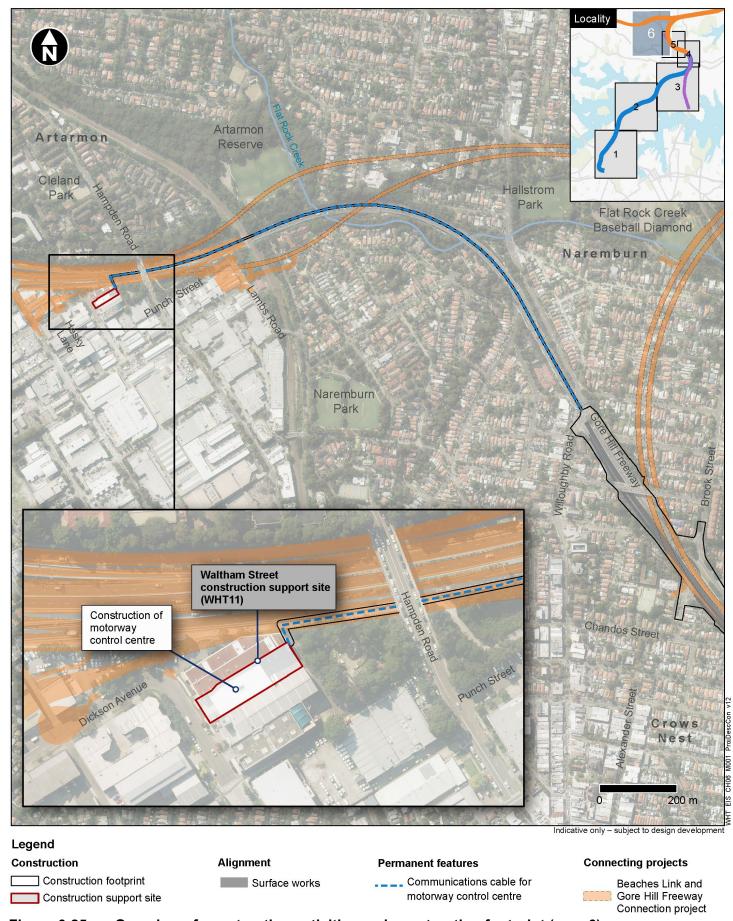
Overview of construction activities and construction footprint (map 6)
